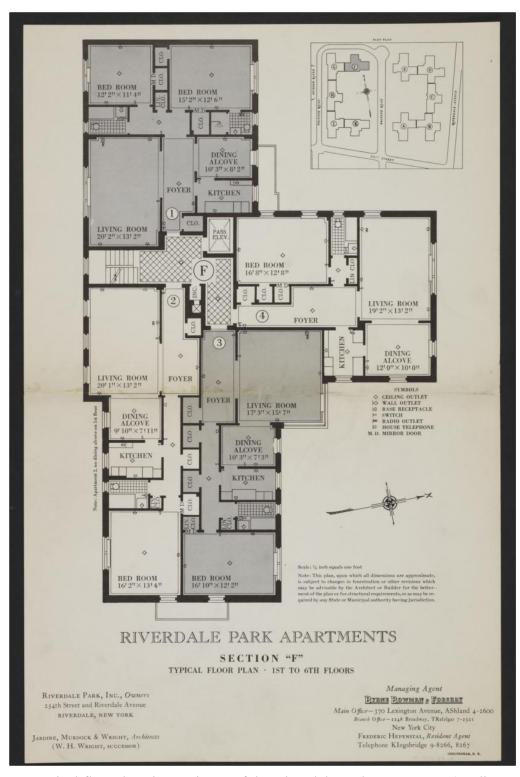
Typical floorplans in Section F of the Riverdale Park Apartments (Jardine Murdock and Wright 1939).
